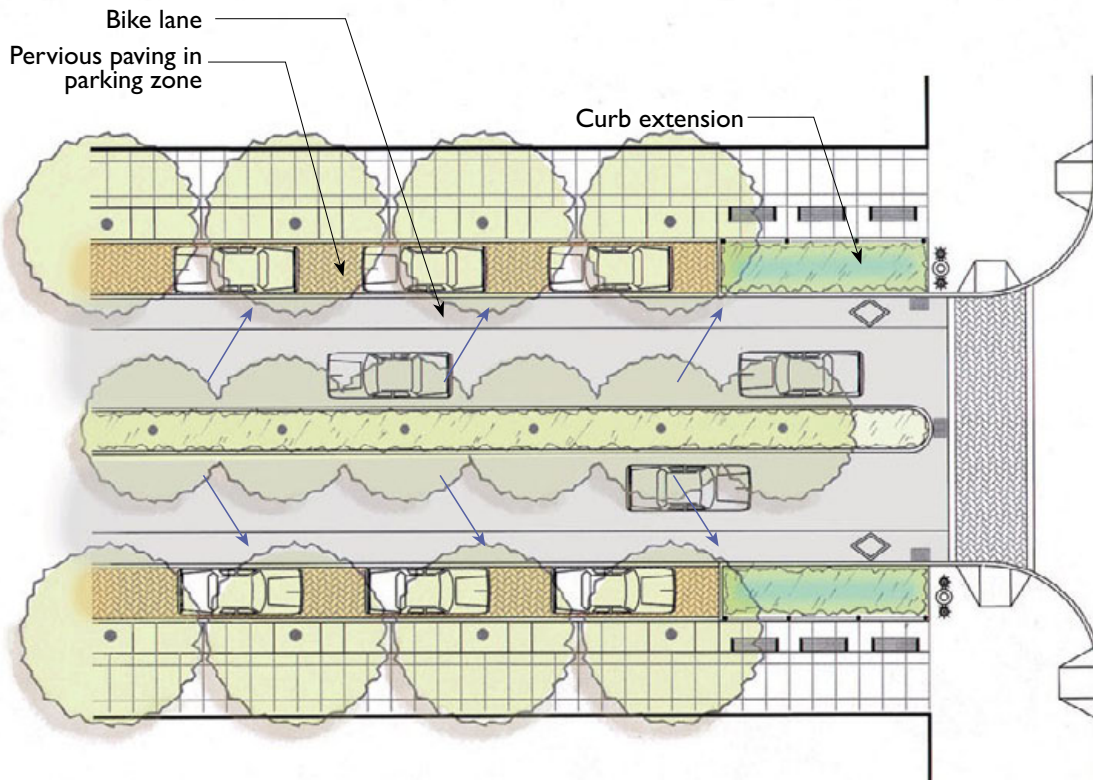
Stormwater curb extensions with pervious paving in parking zone—plan view.
